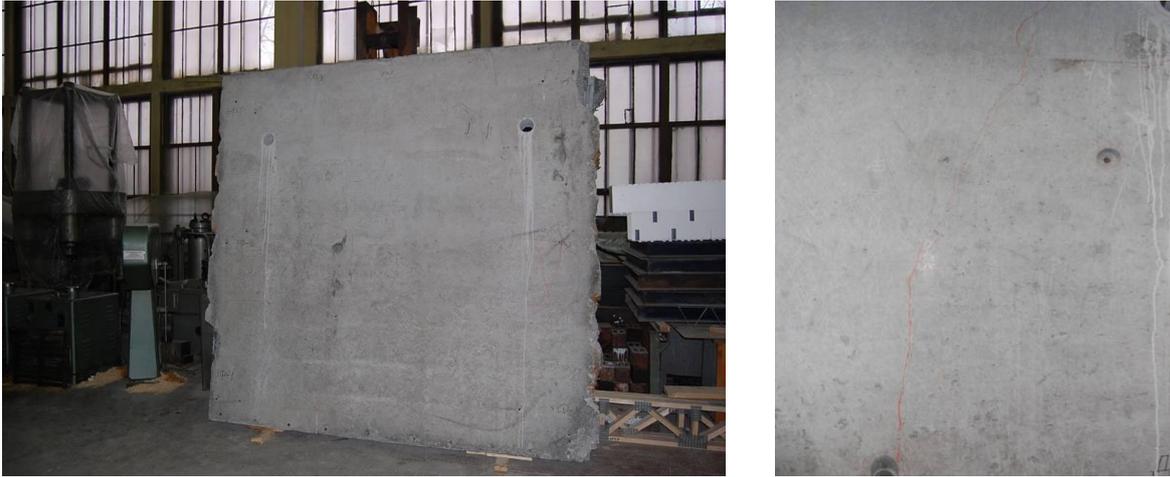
Wall panel BC-111 and vertical crack across the wall panel due to seismic loading test
